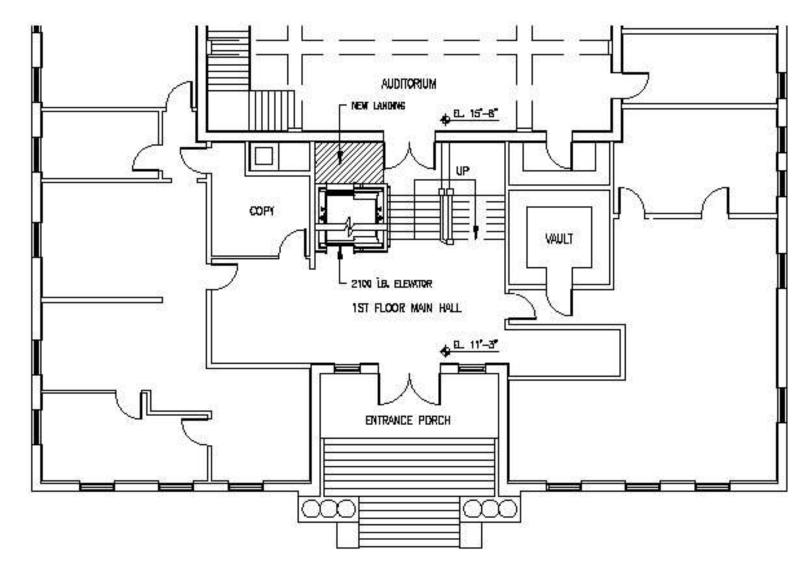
2100 lb. Elevator 1<sup>st</sup> Floor / Auditorium Plan
